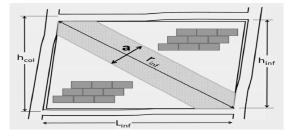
Equivalent diagonal compression strut model for infill wall (FEMA 365,200)
